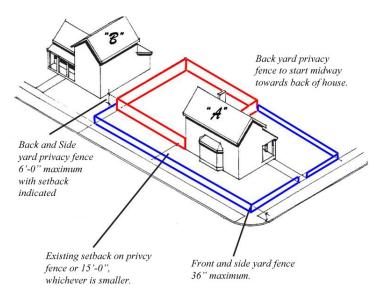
Fences in side yards for houses on street corners should not block front yard of houses located behind them.
